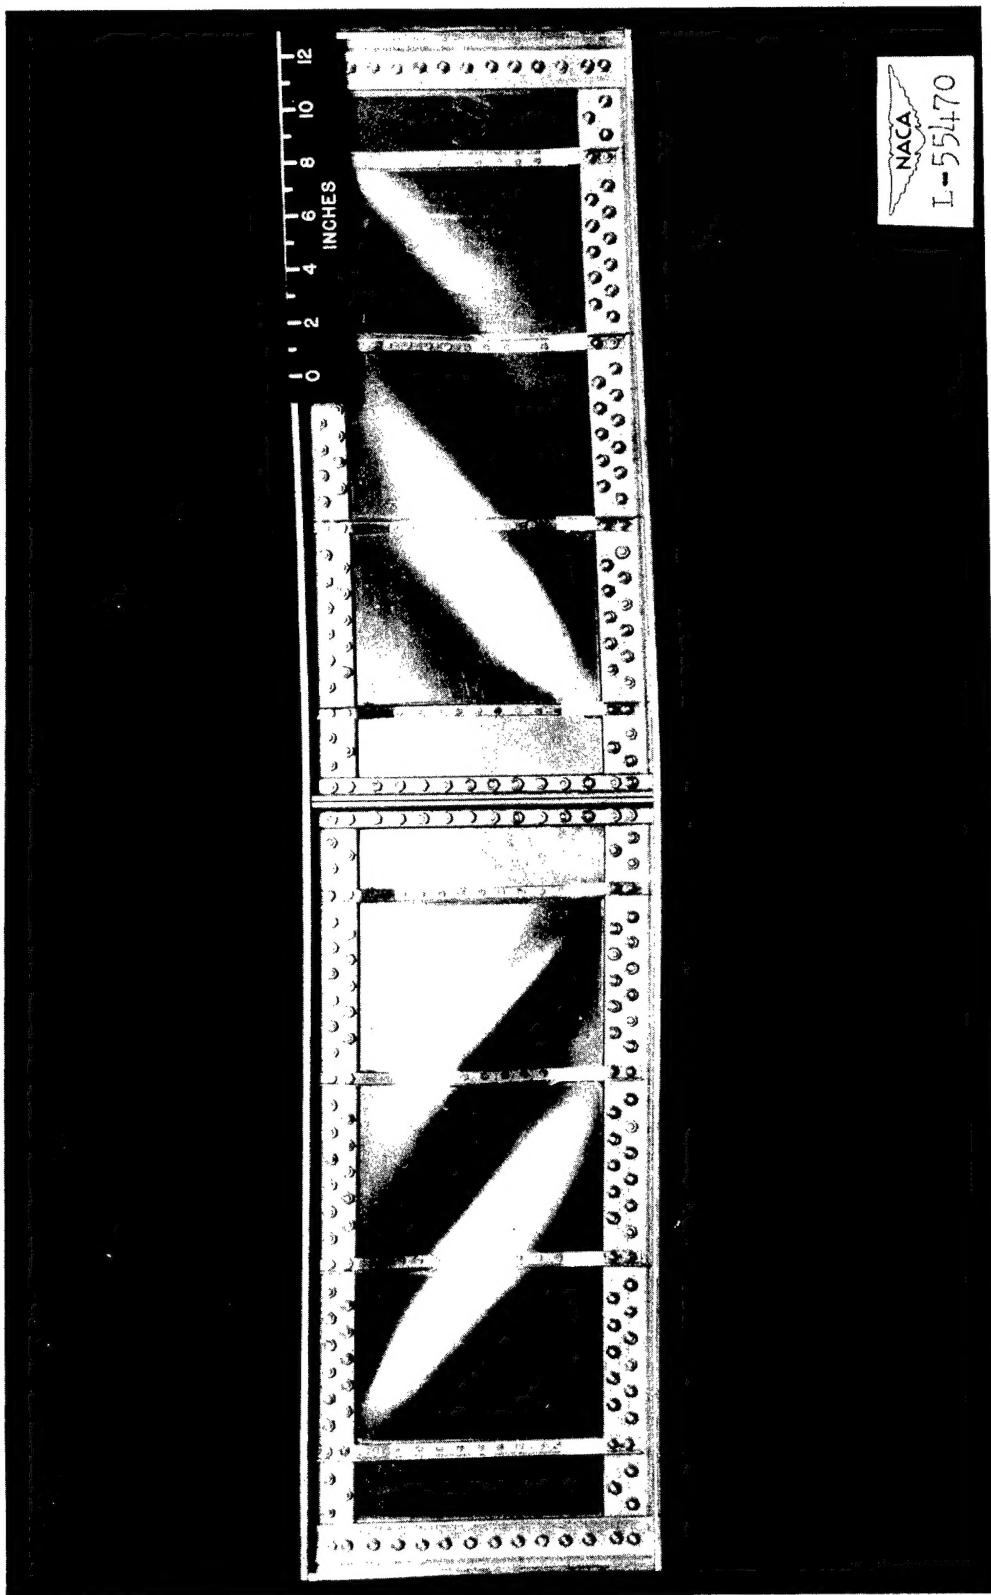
Thick web beam (with uprights connected to flanges) after failure.
